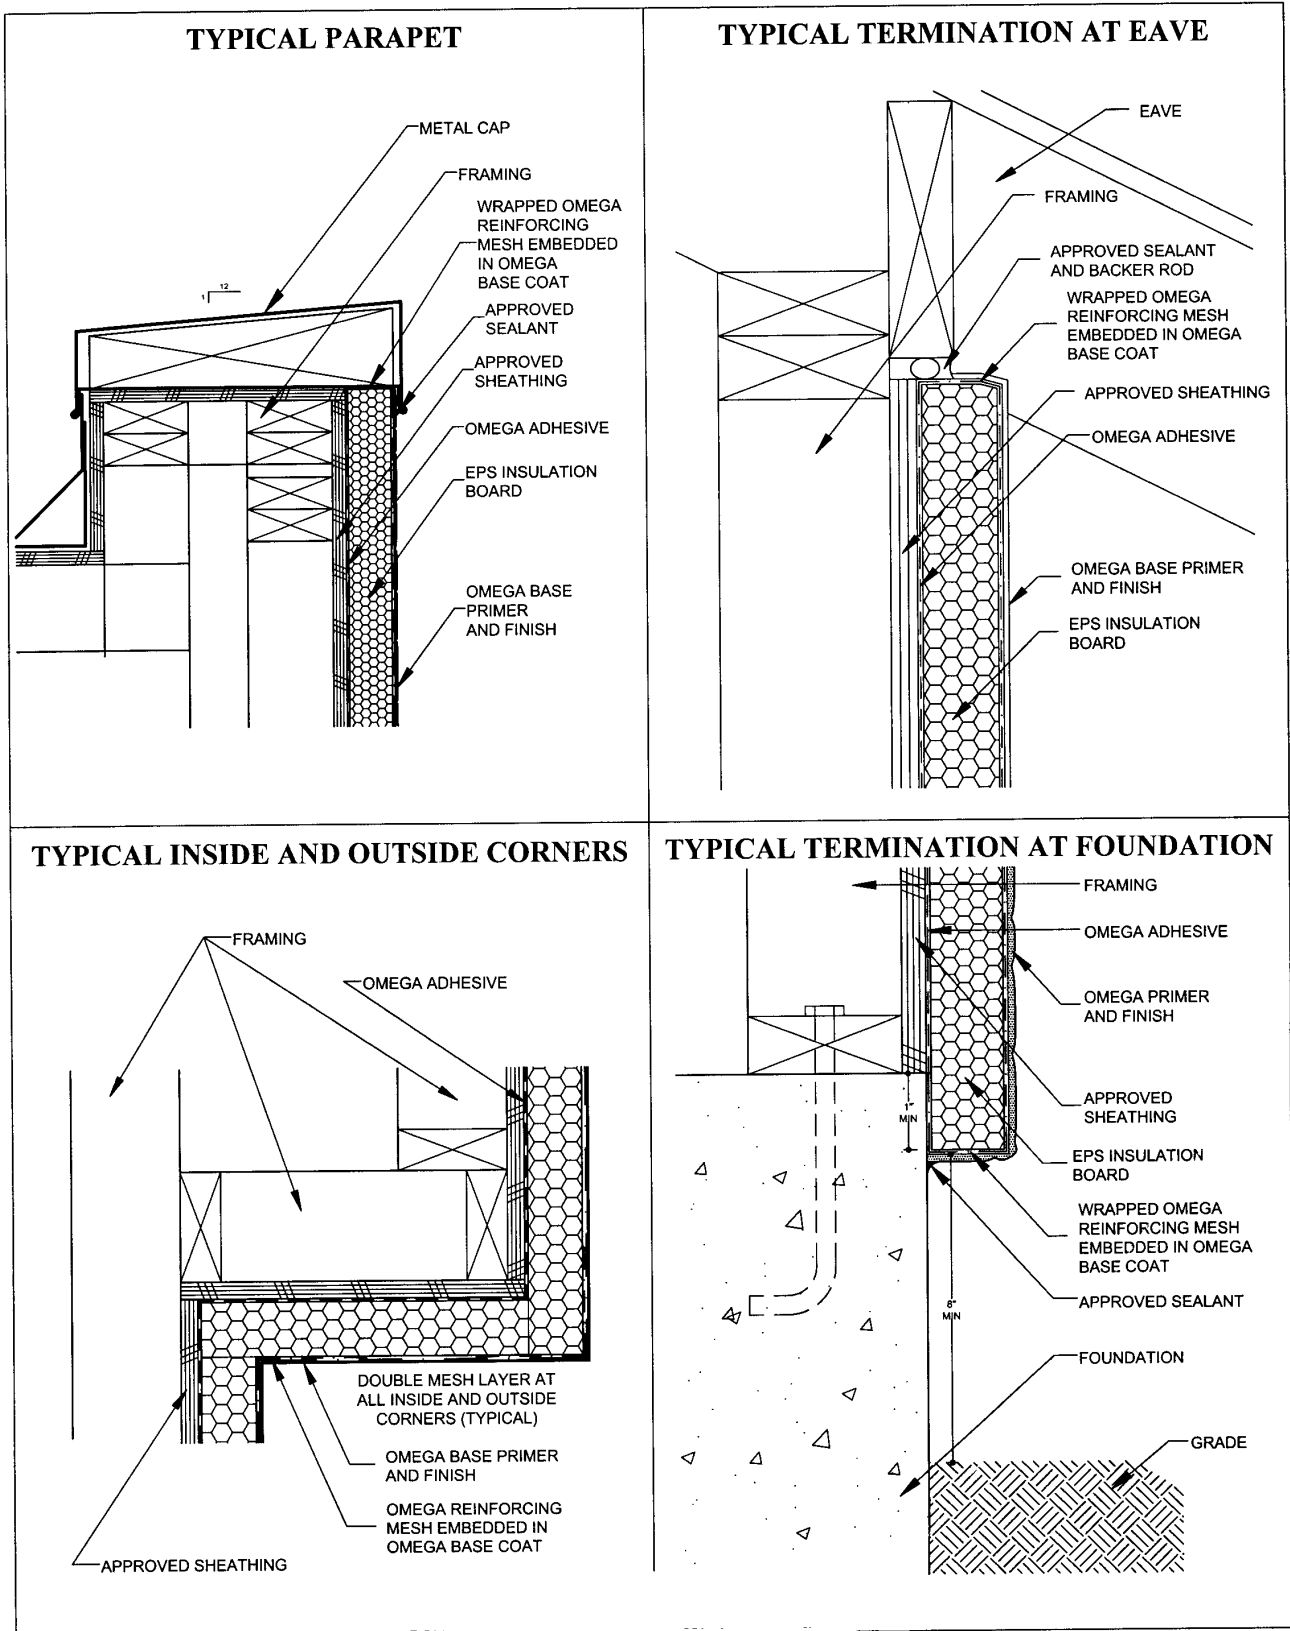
TYPICAL INSTALLATION DETAILS OF ADHESIVELY ATTACHED SYSTEM
